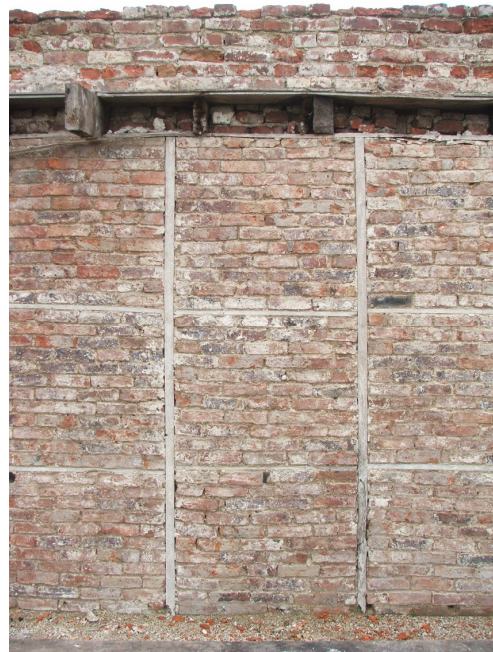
Early 006 brickwork with 070 joists ends cut into and partition 021 built up to /with 070 joists and flooring above
